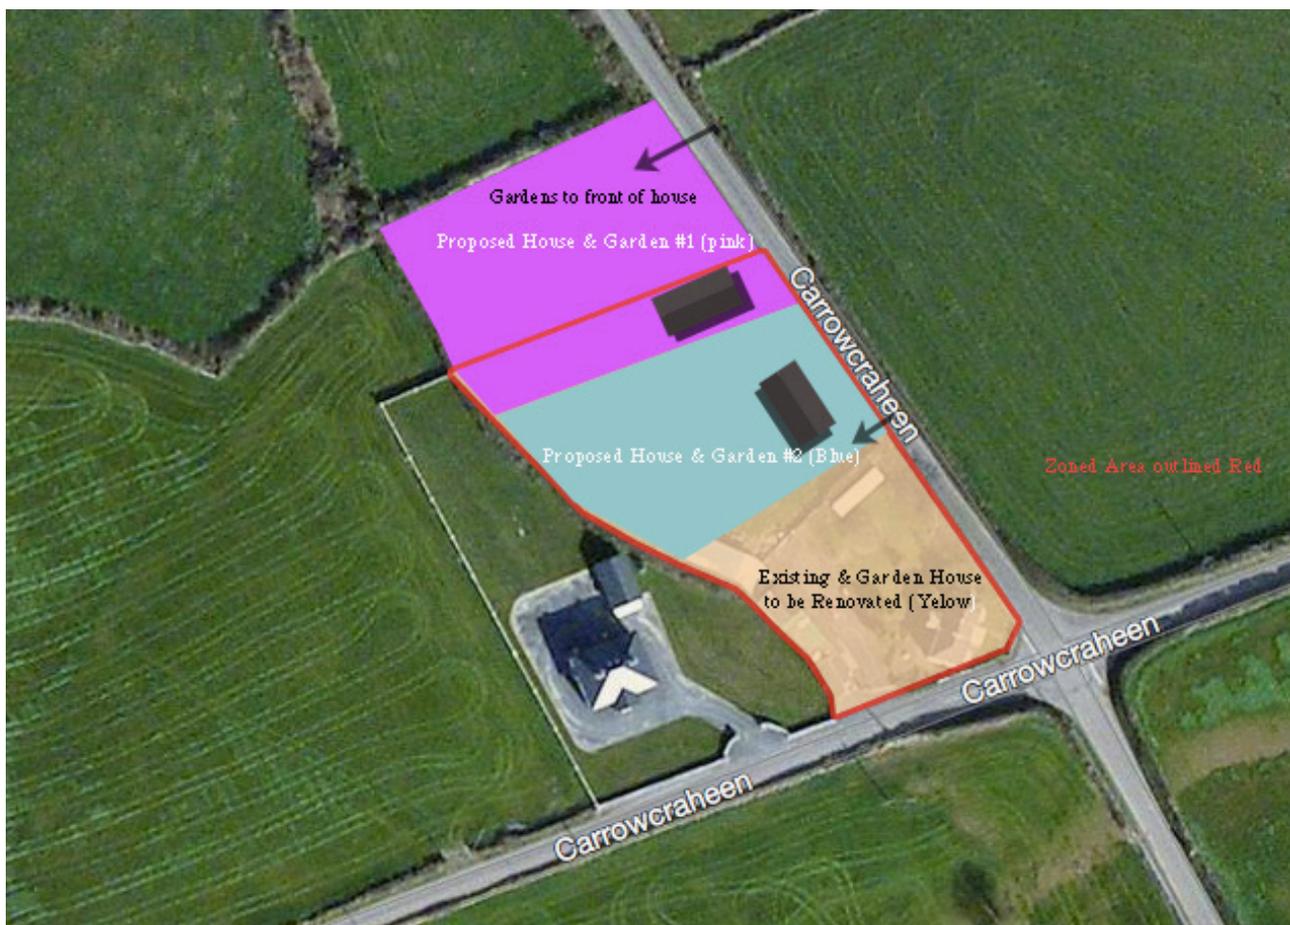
Aerial Photograph showing proposed site layout for permission to renovate existing dwelling and construct two detached houses. House #1 has to be angled with its gable to the road in order to have the footprint of the house within the settlement boundary.
